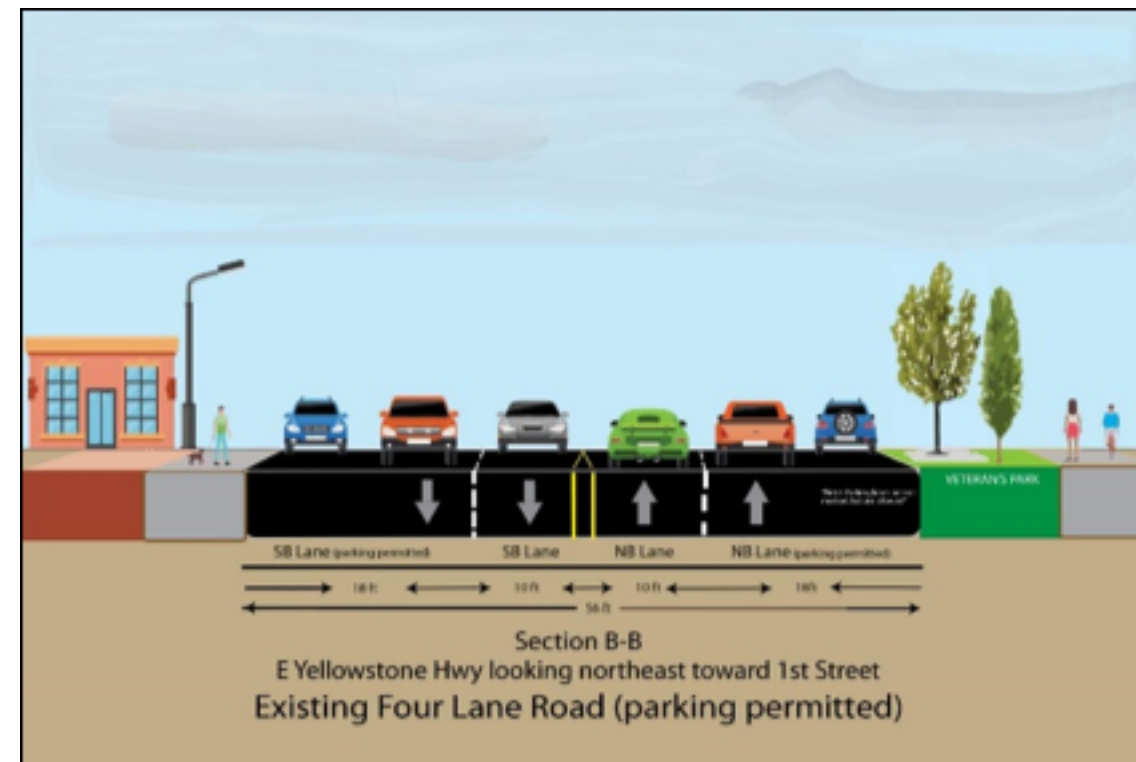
Existing Cross Section – Yellowstone Highway (North of 2nd Street)
